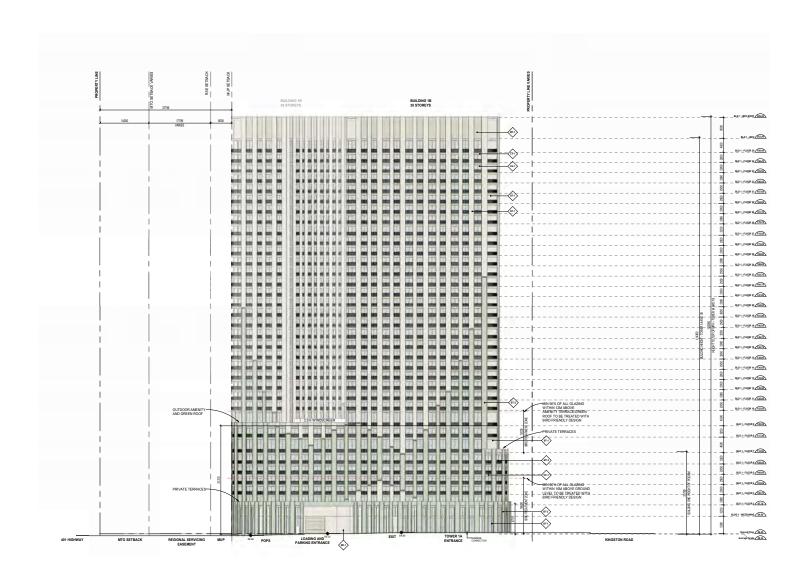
East Elevation (BDP. QUADRANGLE ARCHITECTS LTD.)
